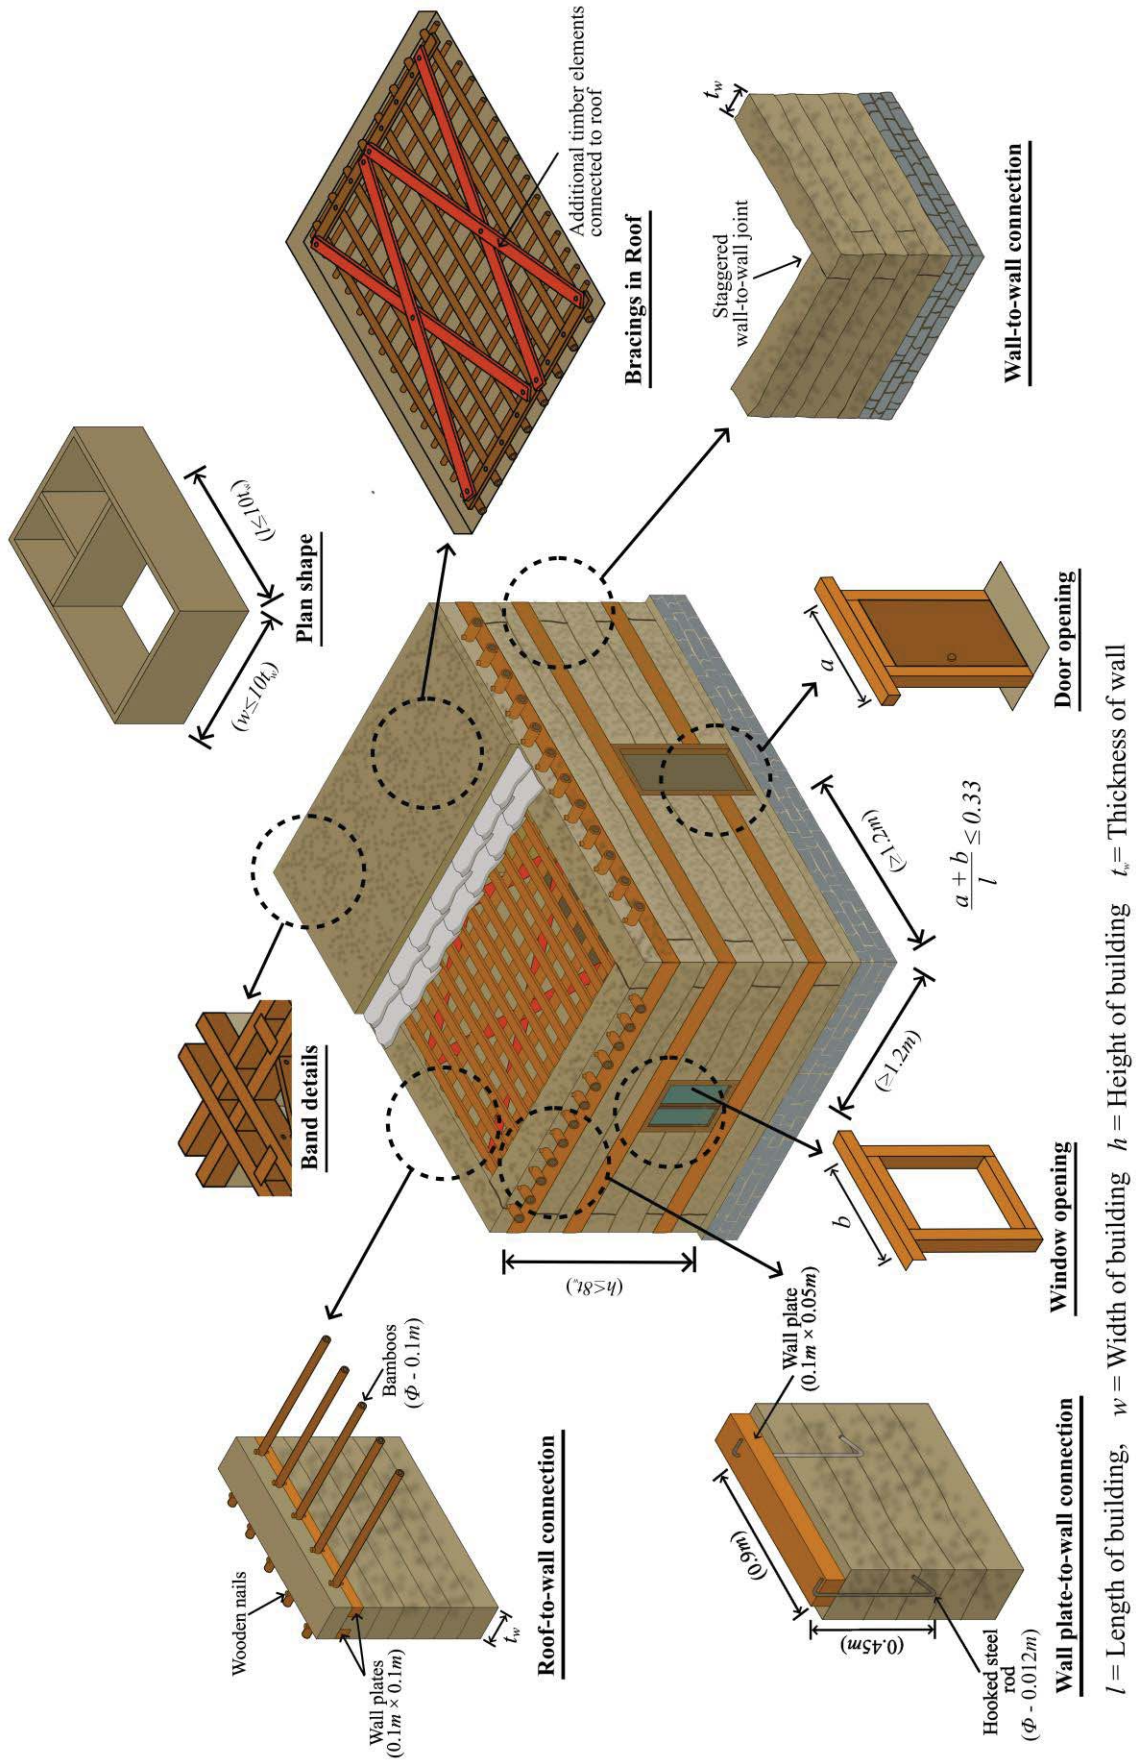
Suggested safety measures for new rammed earth buildings
